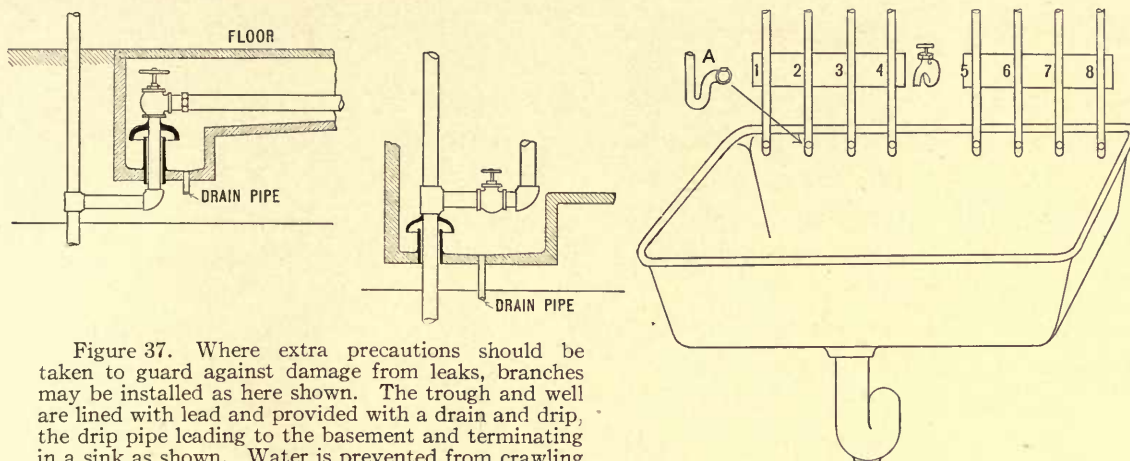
Where extra precautions should be taken to guard against damage from leaks, branches may be installed as here shown. The trough and well are lined with lead and provided with a drain and drip, the drip pipe leading to the basement and terminating in a sink as shown. Water is prevented from crawling along the pipe by the umbrella which is attached to the pipe and the sleeve through which the pipe enters the well makes a watertight joint with the trough so that no leak can occur at that point. The branch is taken off at a point somewhat above the bottom of the trough, allowing the branch to sag by its own weight into contact with the trough, then it is free to go and come with riser without setting up any strains. Drain pipes lead to a sink in the basement, where each drip is provided with a water seal and a drip check as shown in the detail, A. By means of these drips the engineer can tell at a glance just where any leaky valve or fitting is located.
